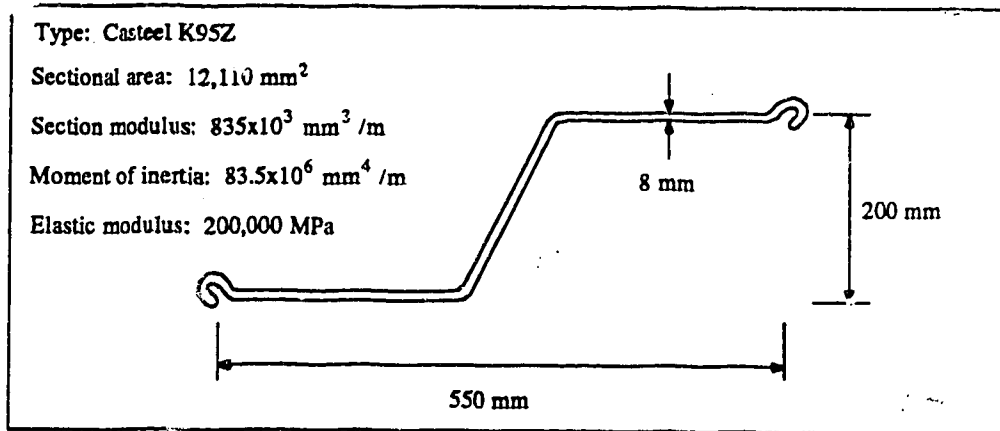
Dimensions and characteristics of the sheet pile section.
